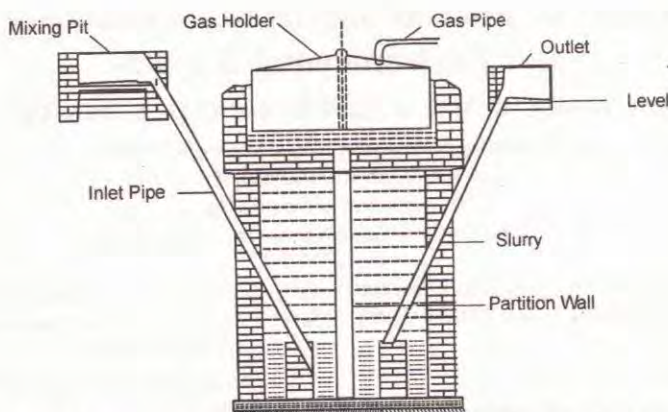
Cross sectional inner view of digester with floating gas holder.
